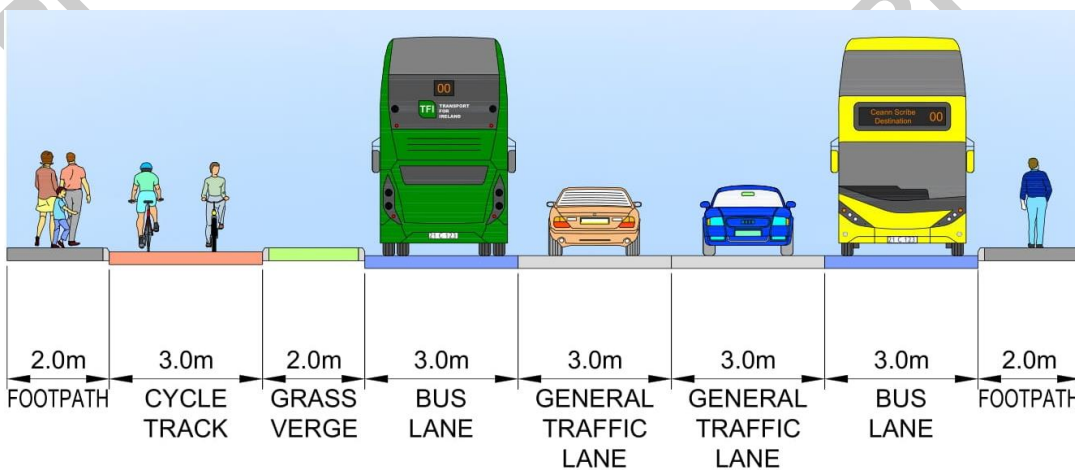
Section 1, Proposed Option 2 – Cross Section A-A
